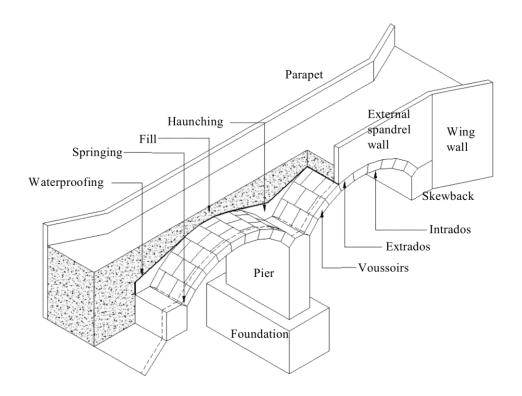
Main elements of a masonry arch bridge (UIC Code 778-3R) [27].
